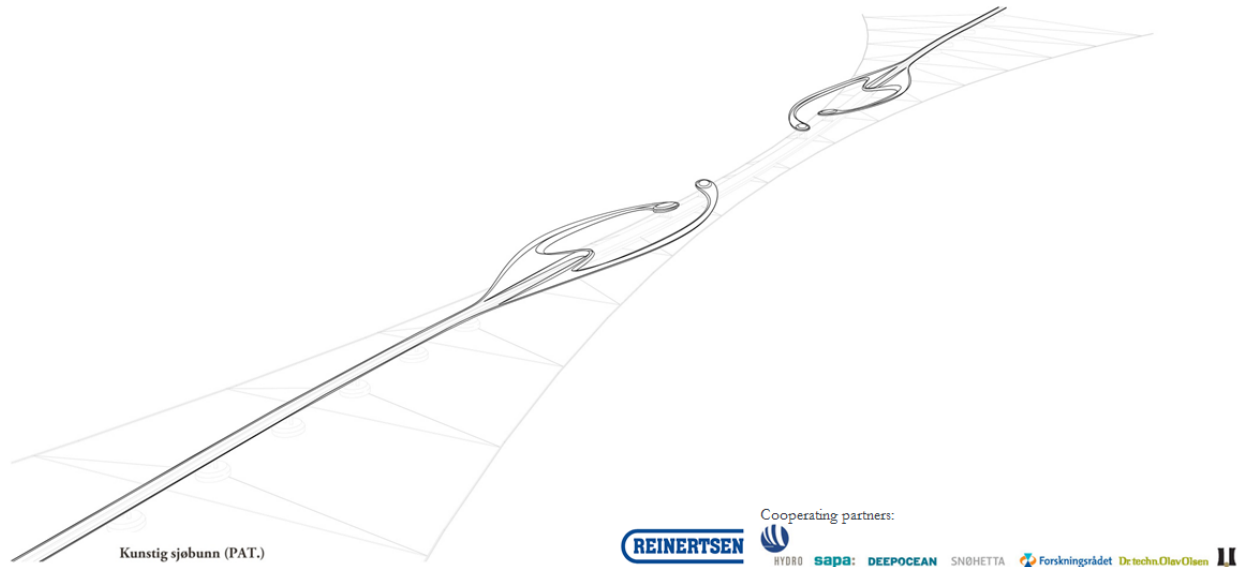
Concept with artificial seabed and mooring, floating bridge, submerged floating tunnel and collision barrier
